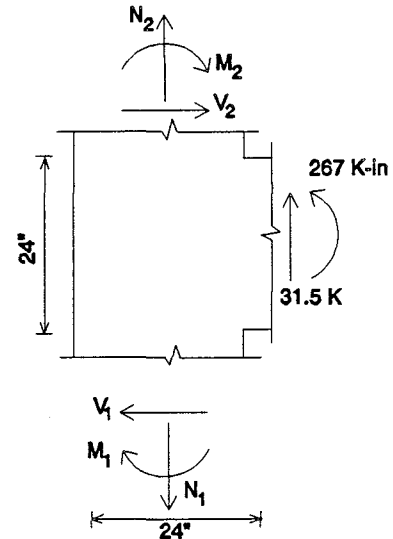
Forces acting on the 2nd floor lintel-column connection of Specimen 1b for the case of load to the right
